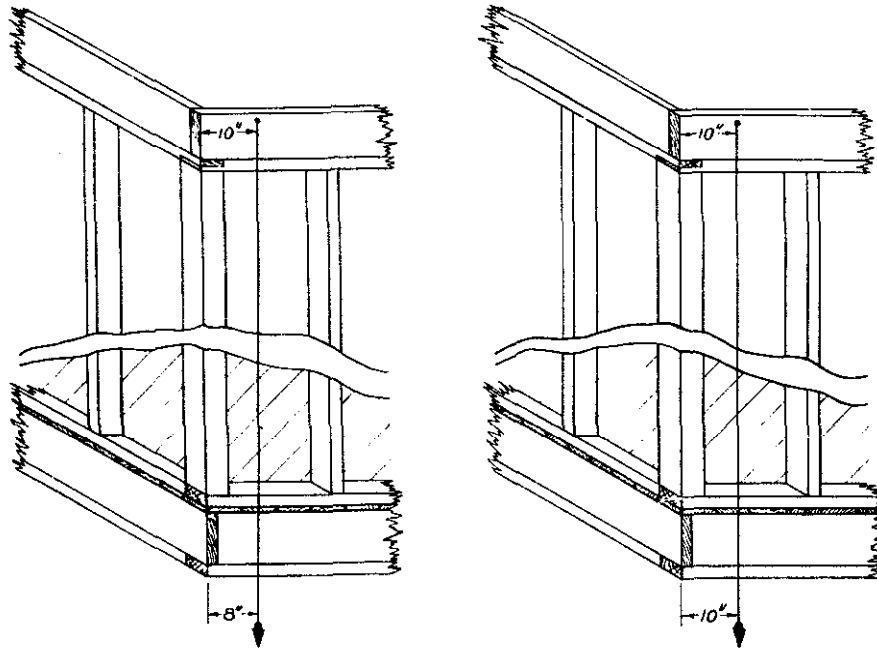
These drawings illustrate how a plumb bob may be used to check whether the corner of a building is plumb, or vertical to a horizontal base. The drawing on the left shows a corner that is not plumb. The drawing on the right shows a corner that is plumb. The distance between the corner and the attachment of the plumb at the top is 10 inches, and the plumb bob at the bottom is also 10 inches from the corner.
